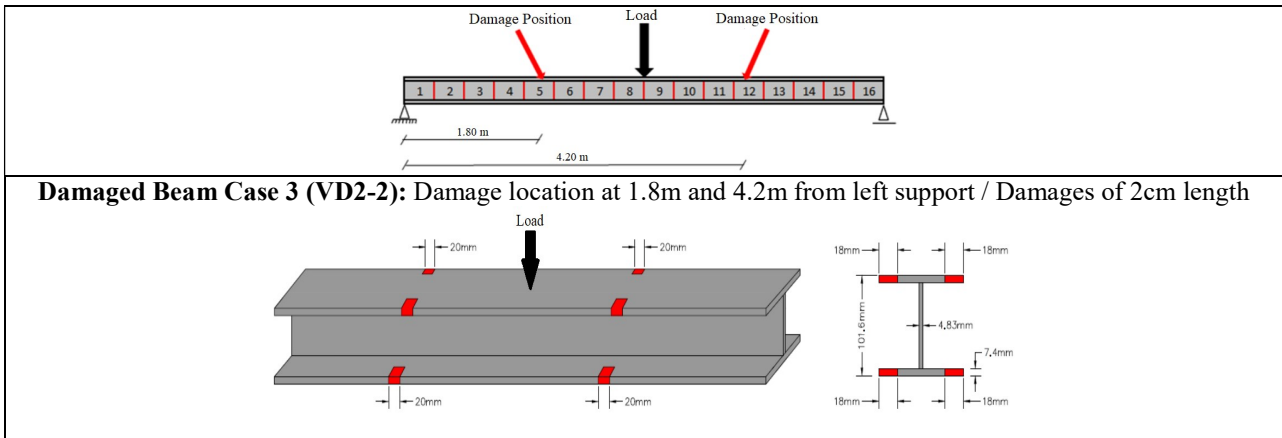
Damaged steel beam: Case 3 VD2-2 (Silva, 2015 [6])
